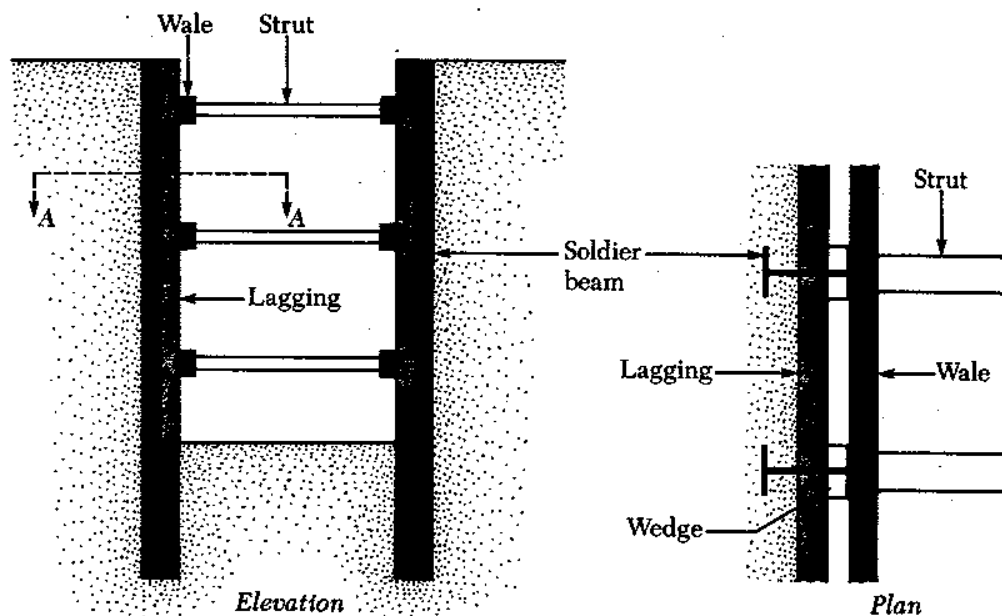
Braced Excavation Elevation View (Das, 2007)
